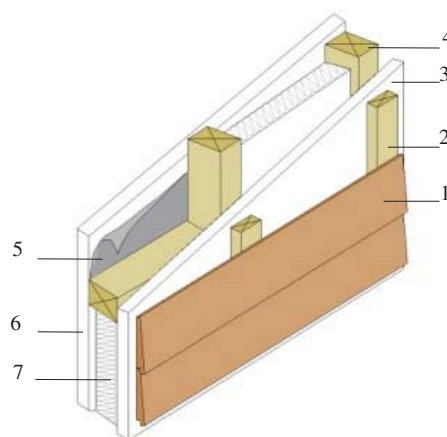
(1) Siding, (2) wood slats, (3) Lining, (4) vertical girder, (5) wind and vapor barrier, (6) Lining, (7) Thermal insulation.
